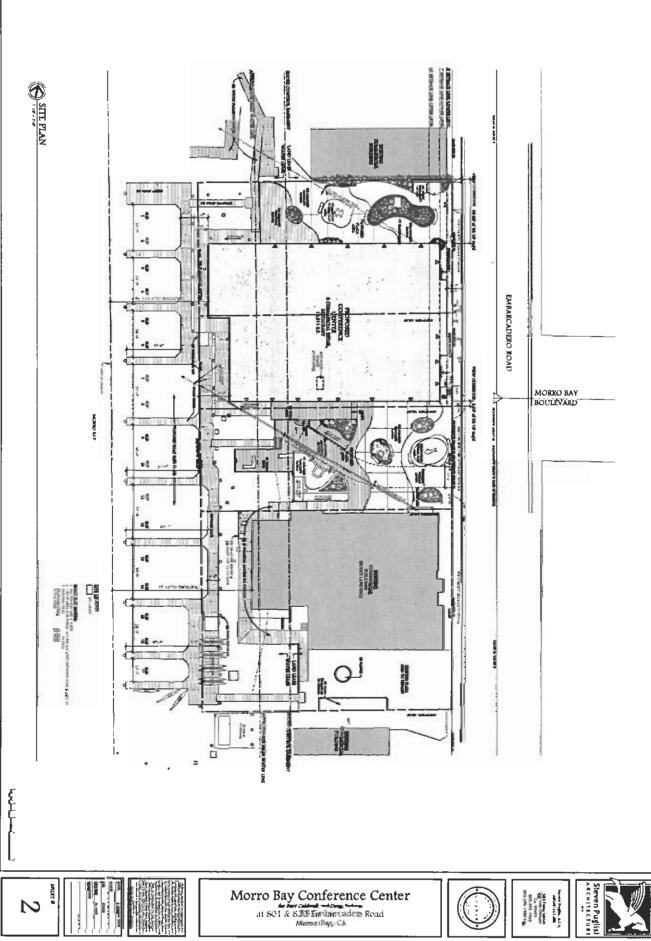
Exhibit B Proposed Site Plans and Elevations Page 1 of 7
